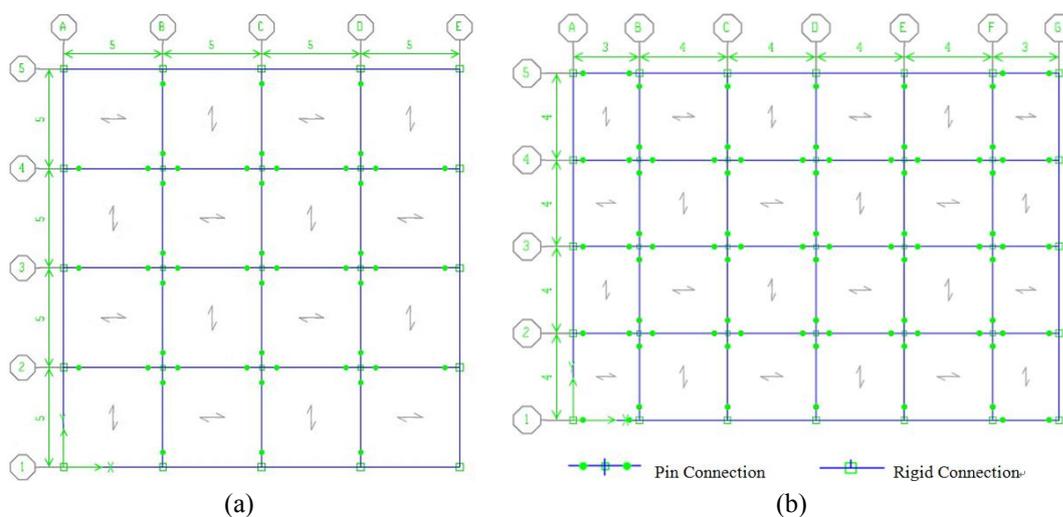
Plan view of (a) four story-building; (b) five-story building
